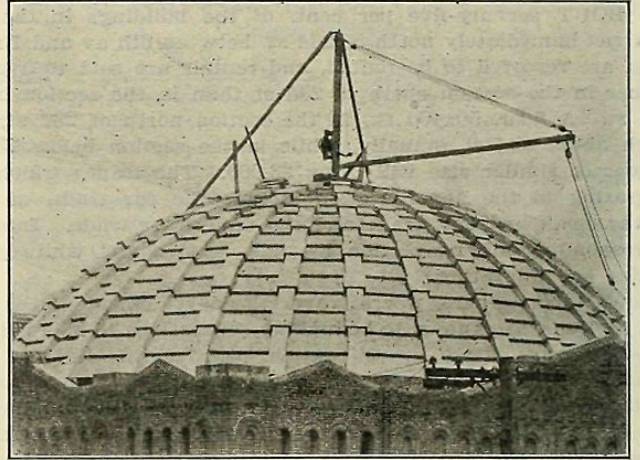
EXTERIOR VIEW OF REINFORCED CONCRETE DOME OF LINDEN BAPTIST CHURCH, CAMDEN, N. J.
